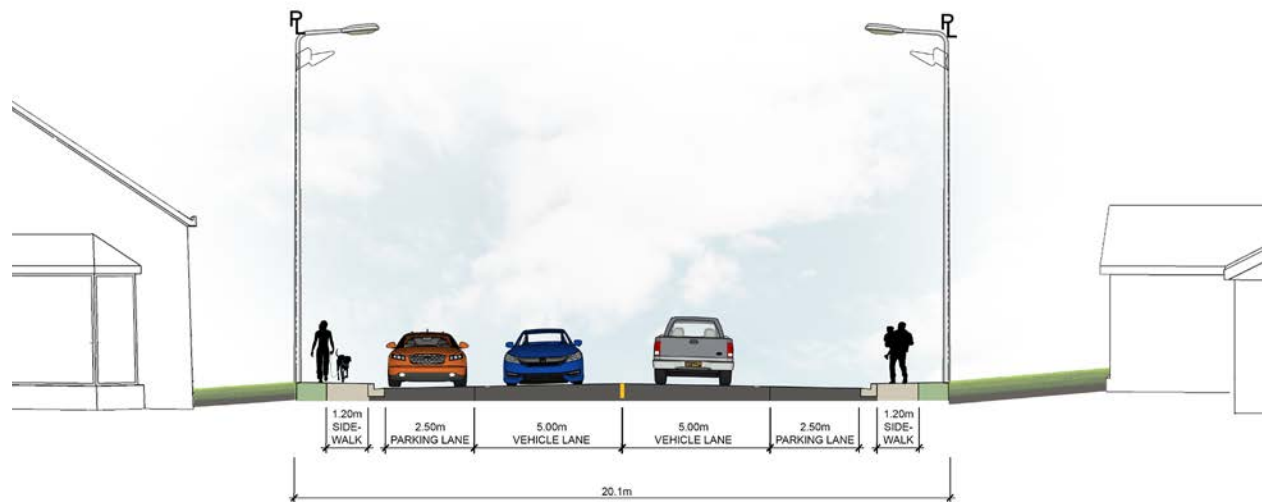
THE EAST END TYPICAL SECTION - EXISTING CONDITION
